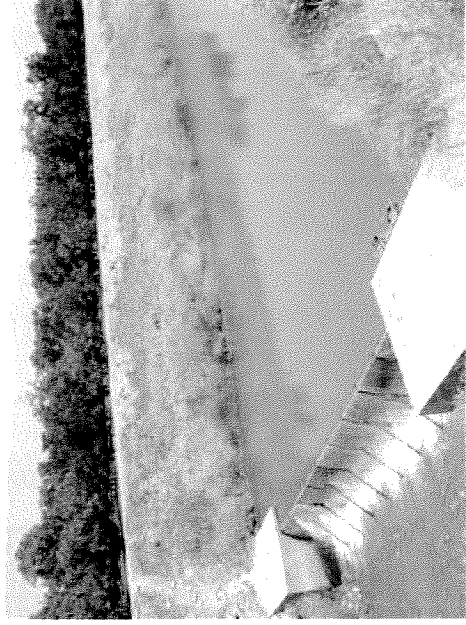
Flashboards in at Lavaggi Flashboard Dam
